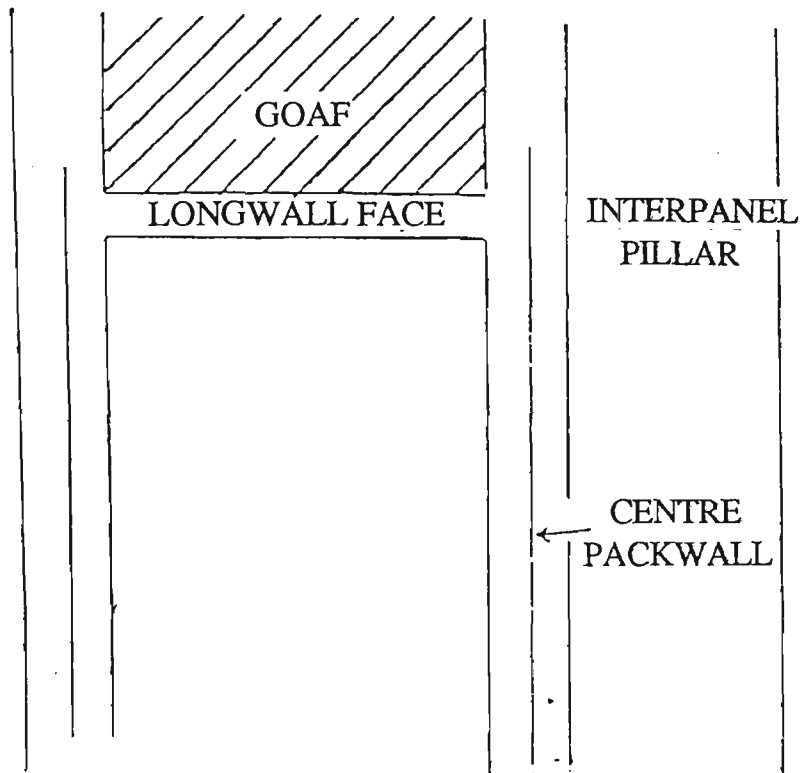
(b) Concept of single entry dividing wall - partial extraction by Longwall with single entry.
